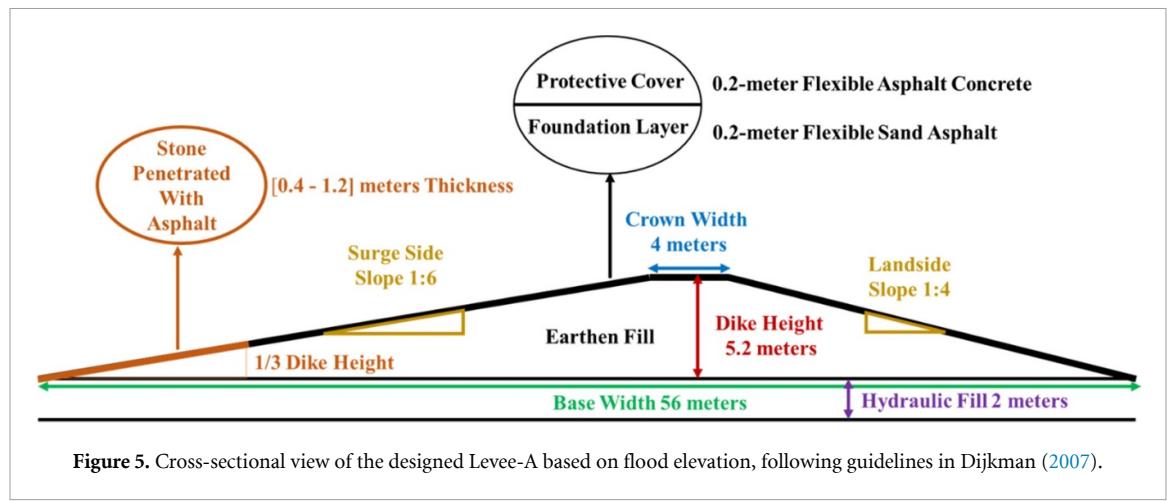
Cross-sectional view of the designed Levee-A based on flood elevation, following guidelines in Dijkman (2007).
